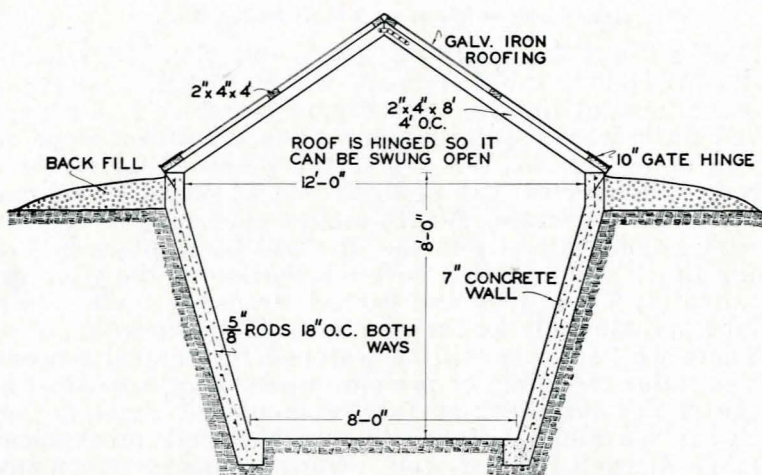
Reinforced concrete and other masonry construction give smooth trench linings and prevent caving of the side walls.
